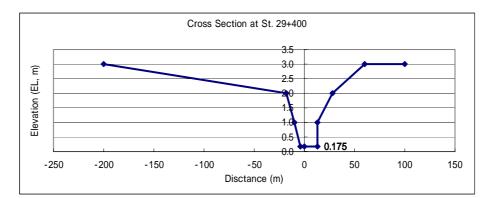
Cross Section of the Dondra Lagoon Channel (1/3)
